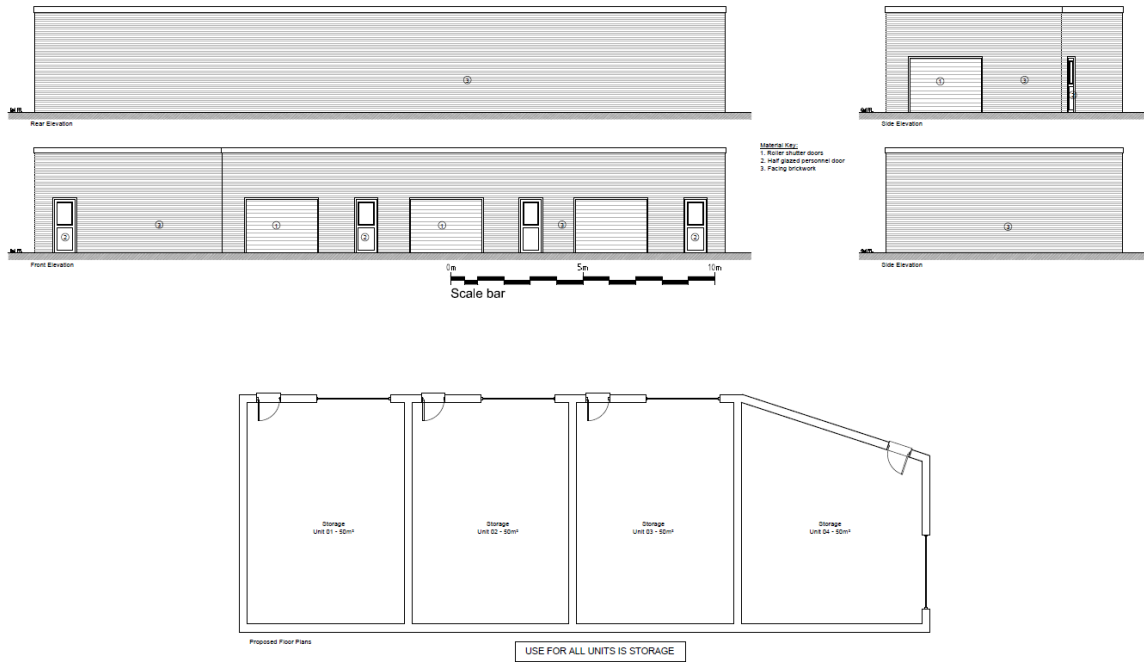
Proposed Outbuilding Elevations and Floor Plans
